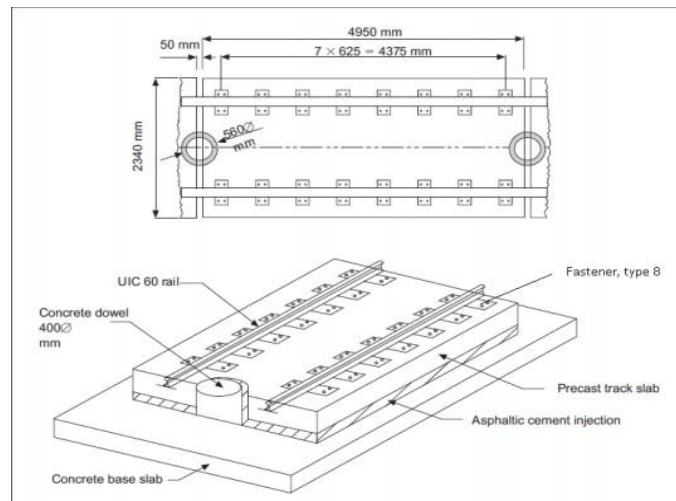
General Layout of Shinkansen Slab Track (Esveld, Modern Railway Track 2nd Edition, 2001)
